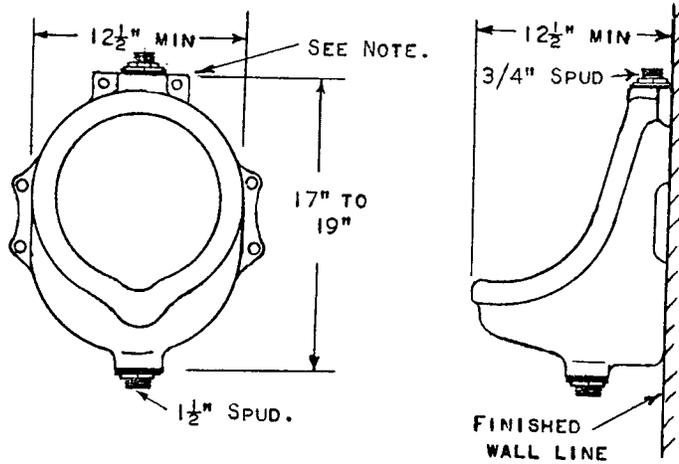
WALL-HANGING WASHOUT URINAL WITH BOTTOM OUTLET. (PAR. 4.3.1.)
